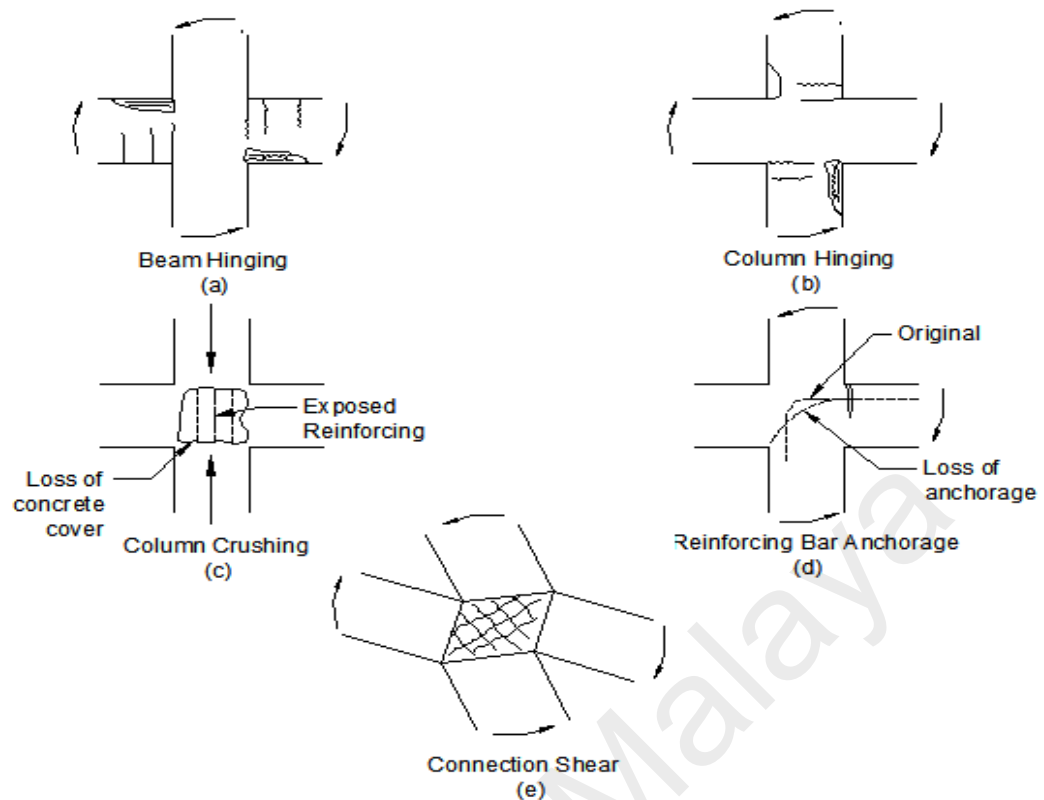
Possible failure modes within beam to column connection's region (Meinheit and Jirsa,1981)
